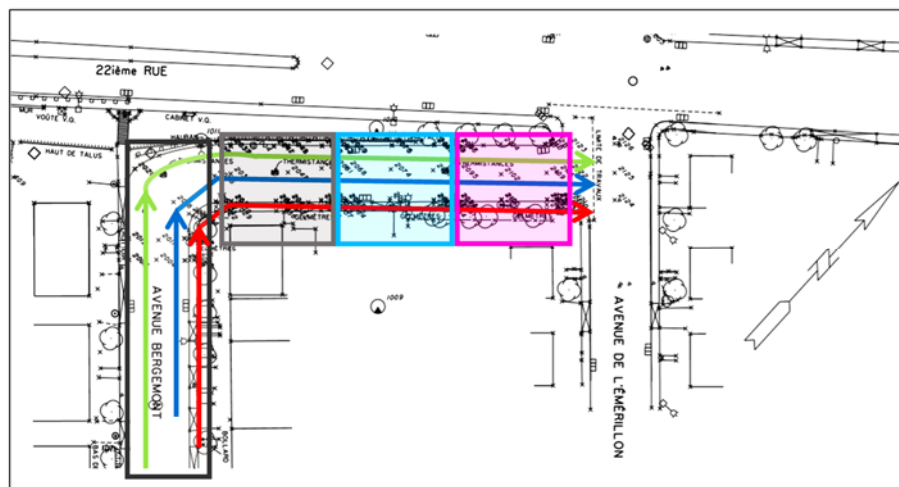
Plan of Bergemont project illustrating the three sections and directions of construction
